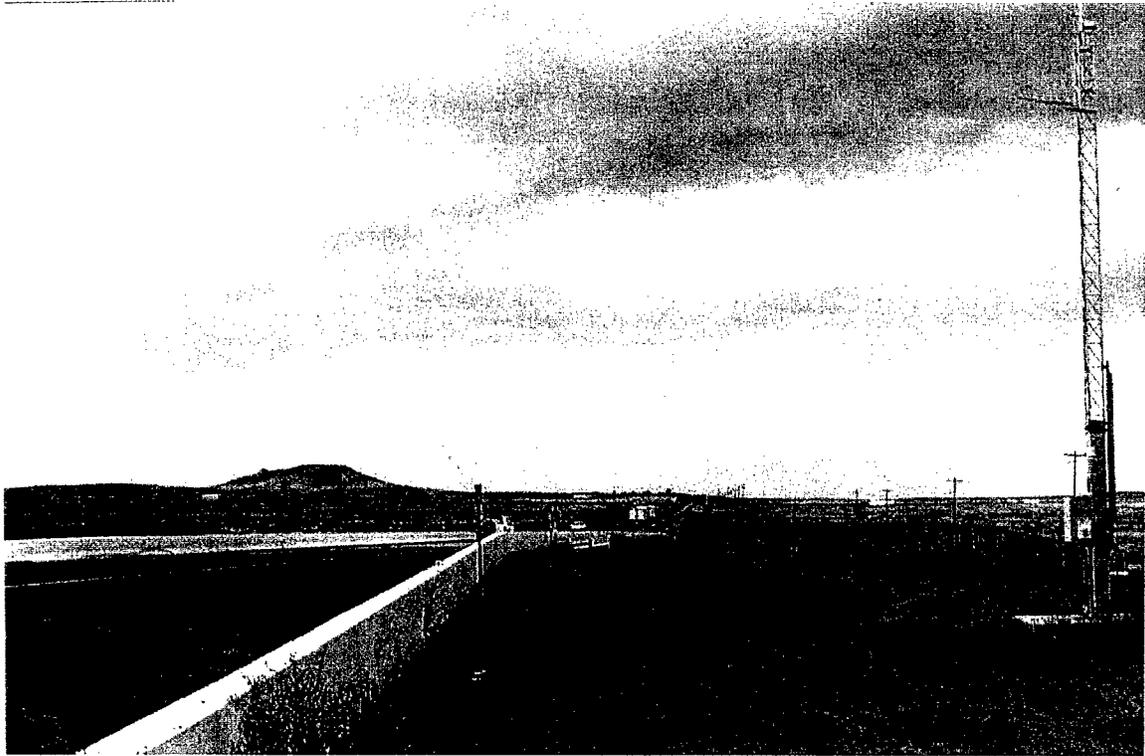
Belle Fourche RPU, looking north. Concrete barrier obstructs blowing snow in direction of prevailing wind (8/14/98).
